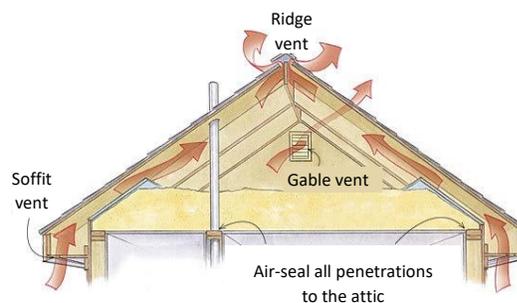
Ventilated roof (Source: FineHomeBuilding.com)
